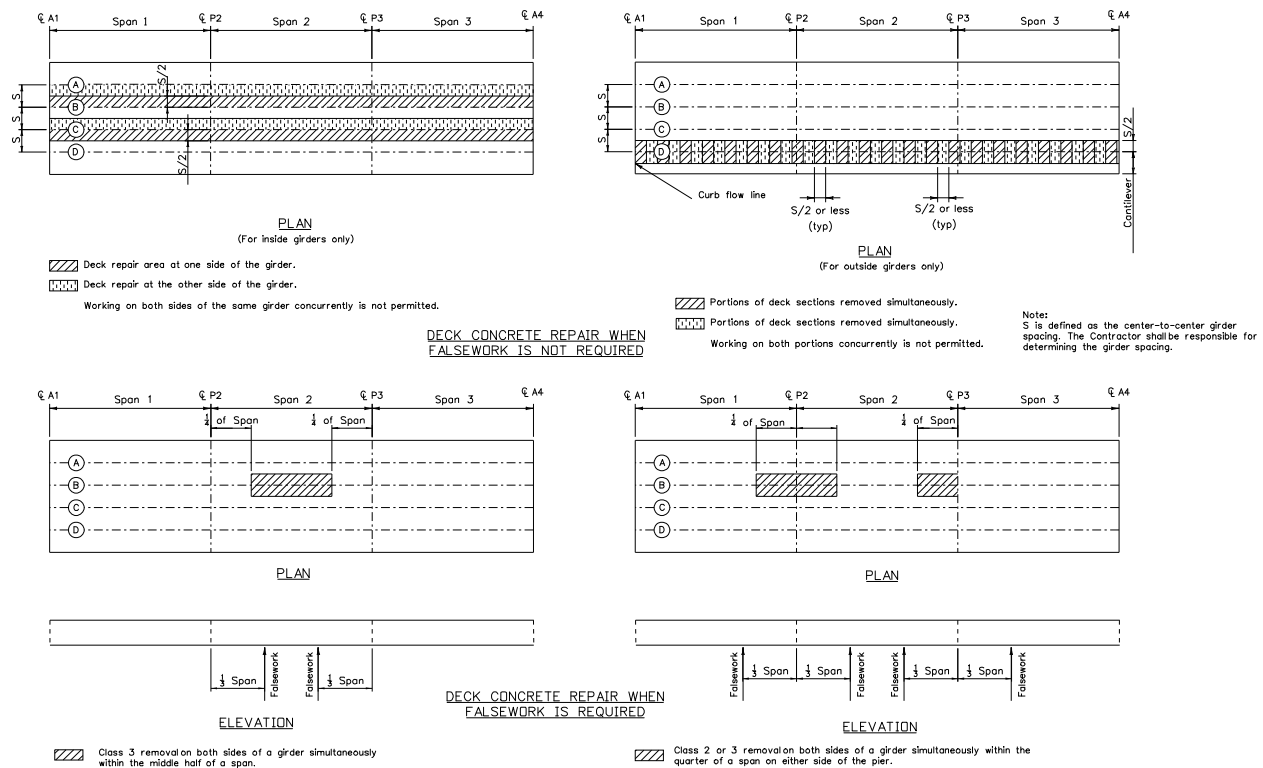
(C)-2 Sample Phasing Details for Girders where Falsework may be required
